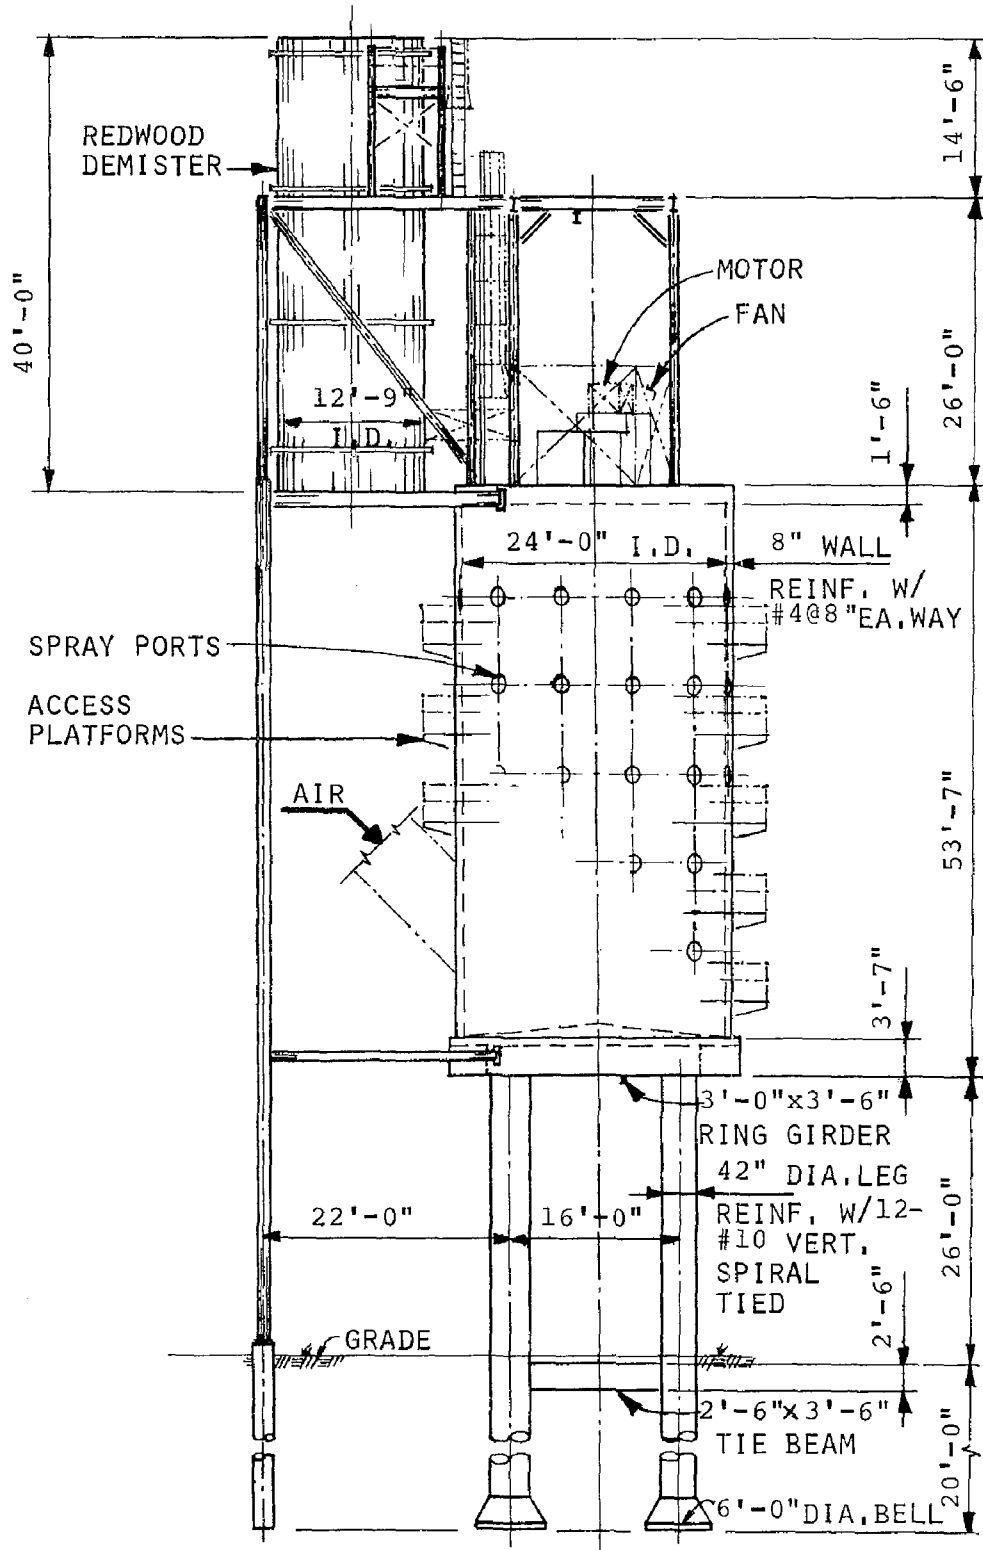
SPRAY TOWER STRUCTURE-WEST ELEVATION
